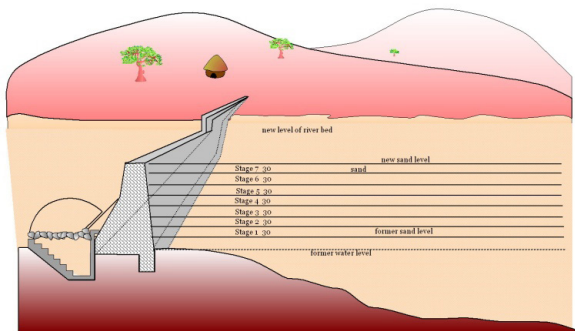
(a) Sketch of a longitudinal section of a sand dam
